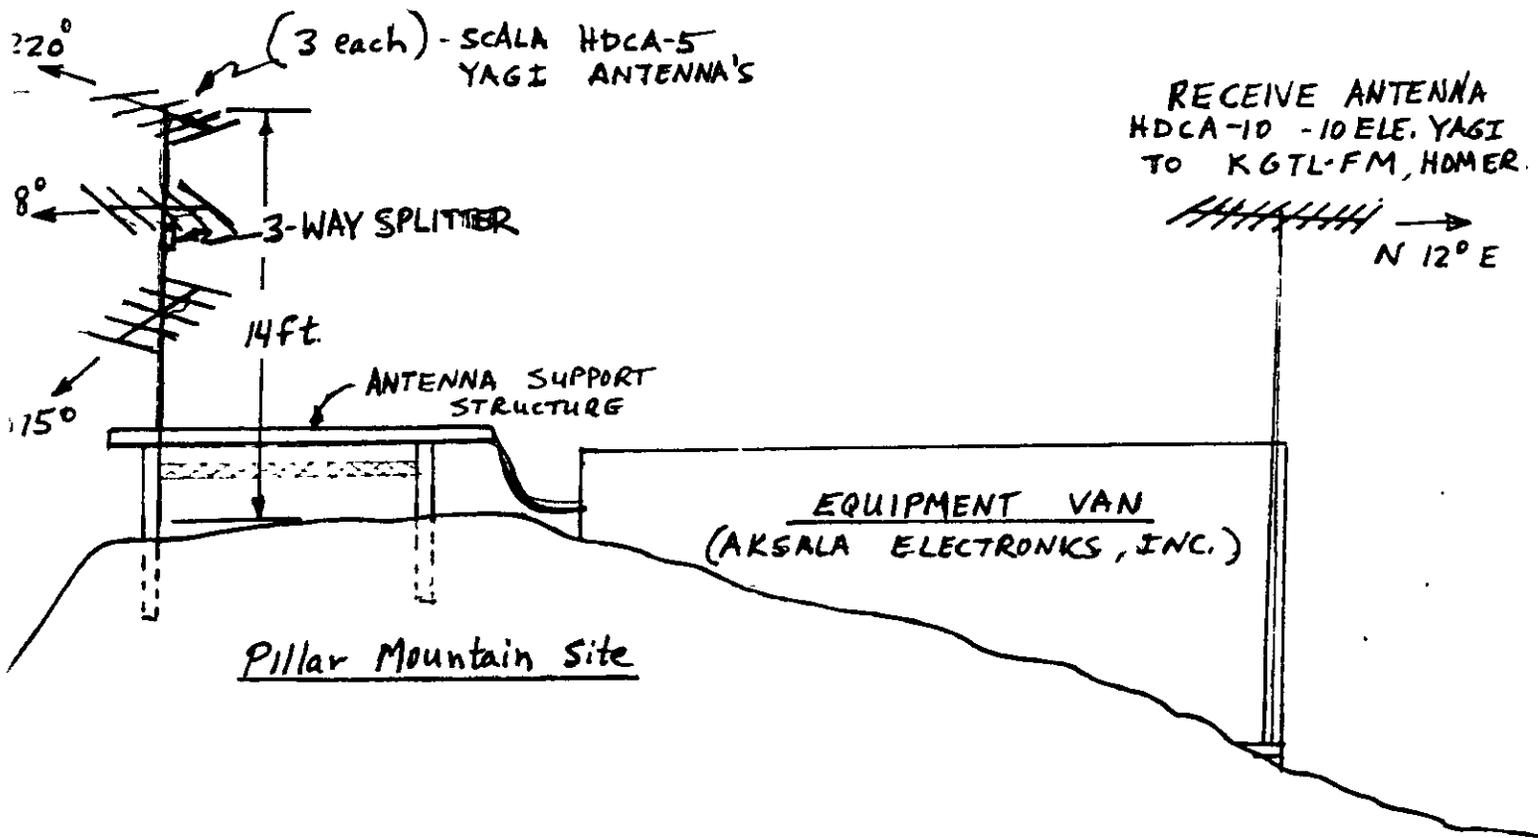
VERTICAL PLAN SKETCH OF PROPOSED STRUCTURE. (Not to Scale)
